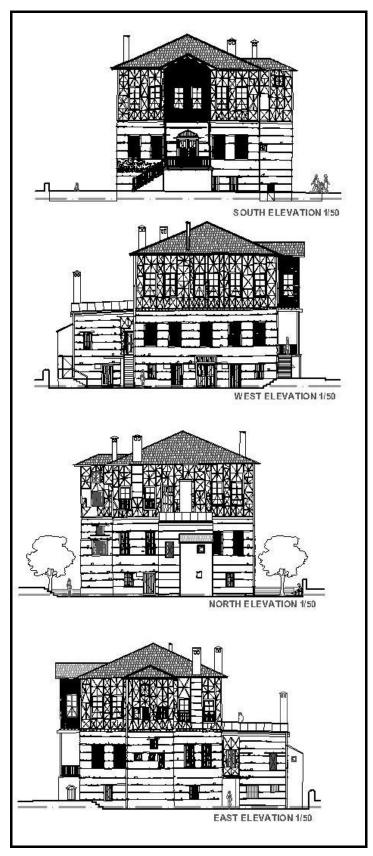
Conservation Proposal of Hasanağalar House – Facades
